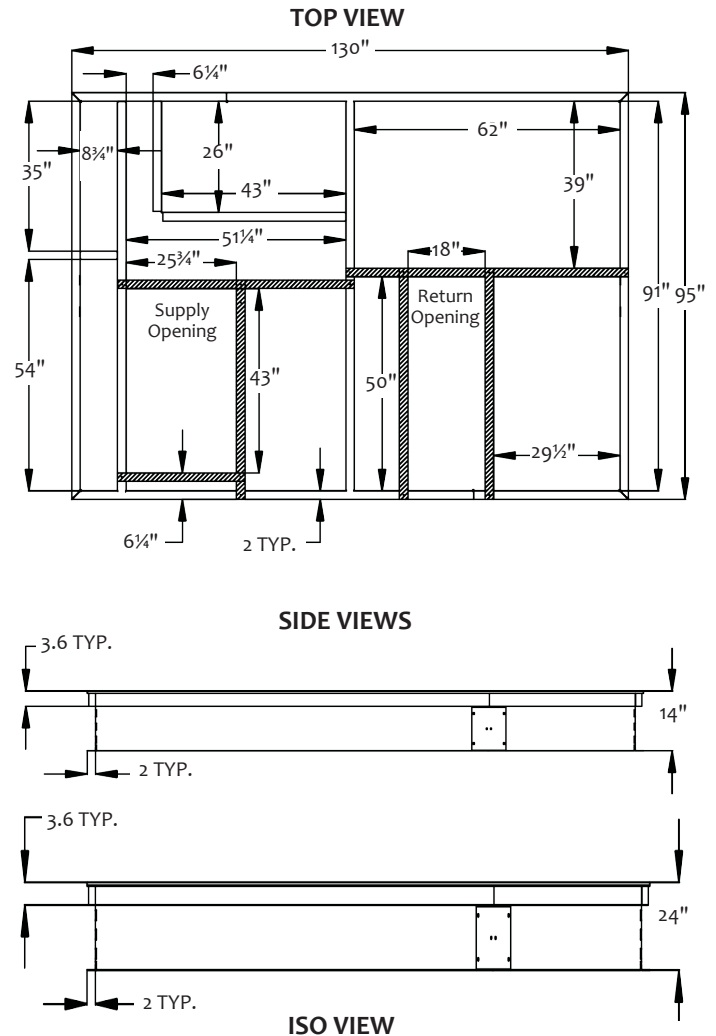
Roof Curb Assembly – 2 Series, Air Cooled & Water Cooled with ECW Wheel - 14" and 24"
